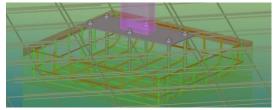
Footing reinforcement & detail of a metallic connection.
